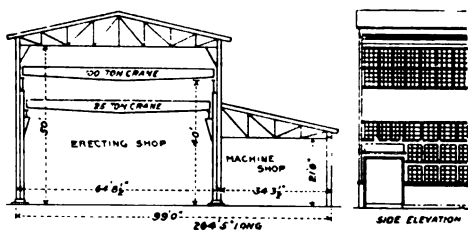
CROSS SECTION AND SIDE ELEVATION OF CROSS ERECTING
